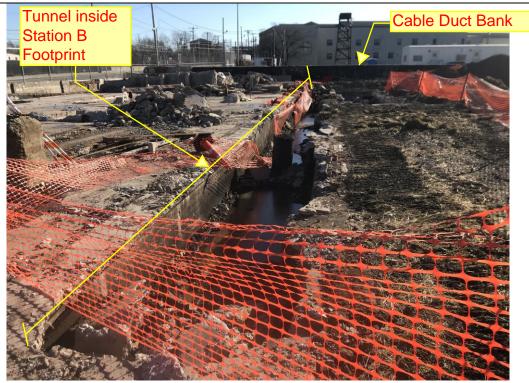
South Side of Station B looking West from West End of the Inside Tunnel
